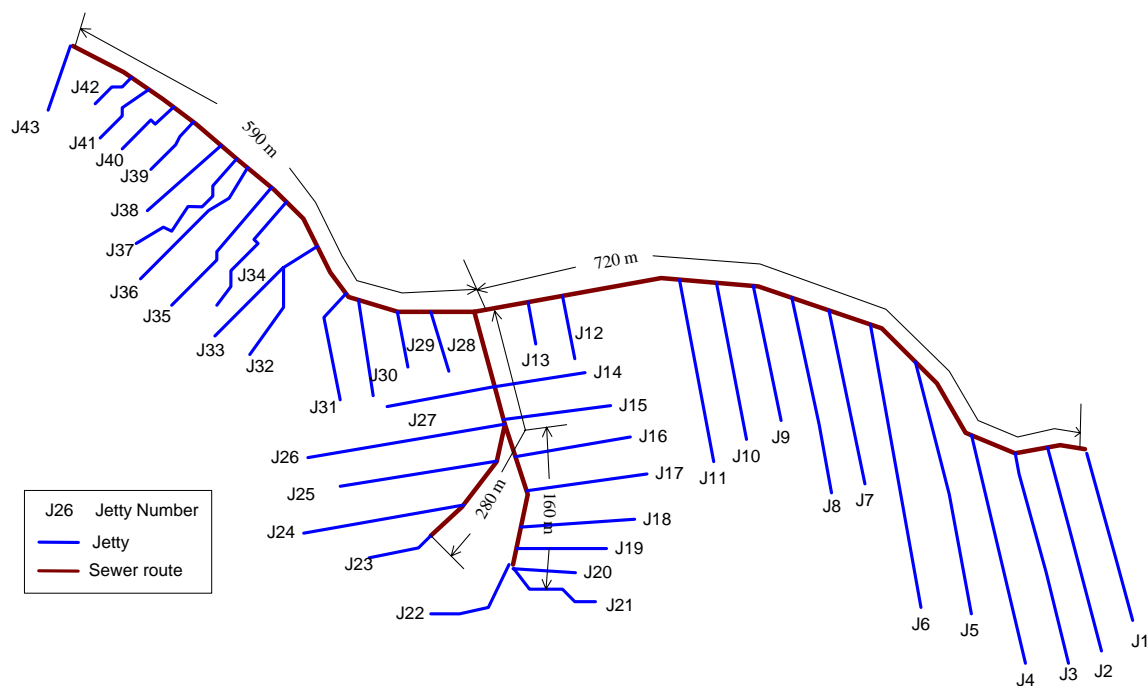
Jetties Location and Proposed Sewer Routes
